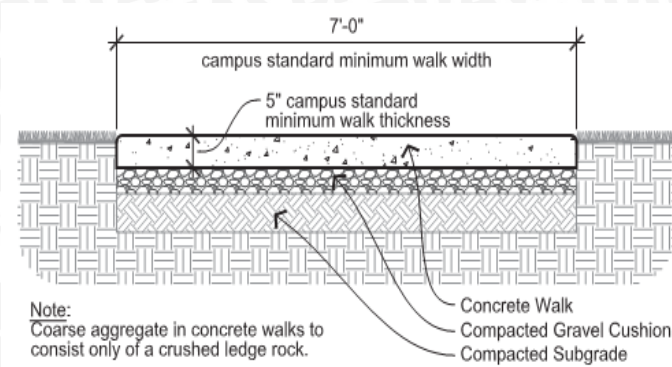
CAMPUS STANDARD SIDEWALK SECTION
